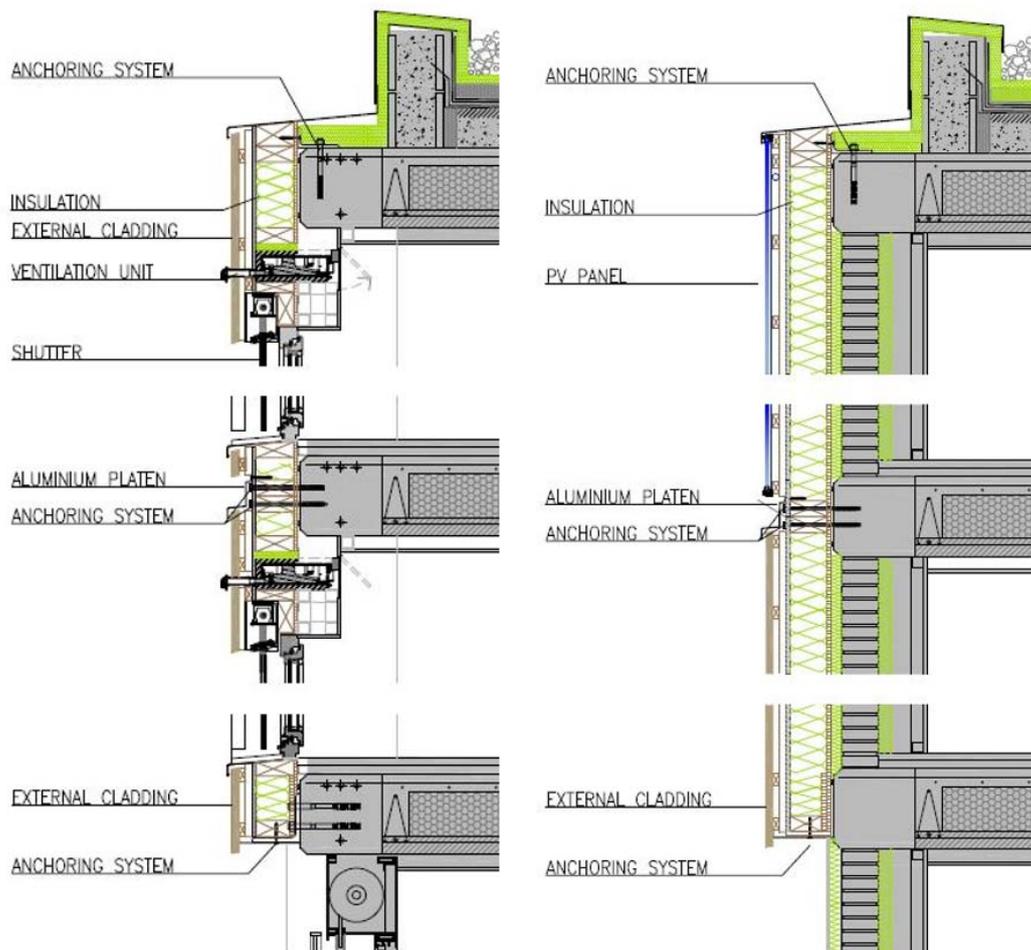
Section Details of the Prefabricated Multi-functional Façade in Spanish demo-case
